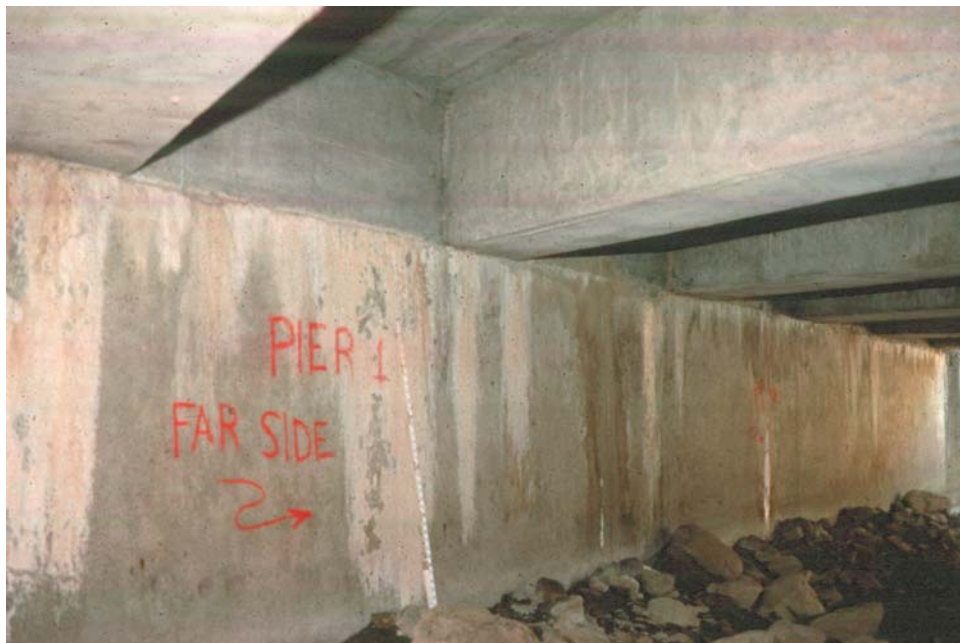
Bearing Area of Typical Cast-in-Place Concrete Tee Beam Bridge
